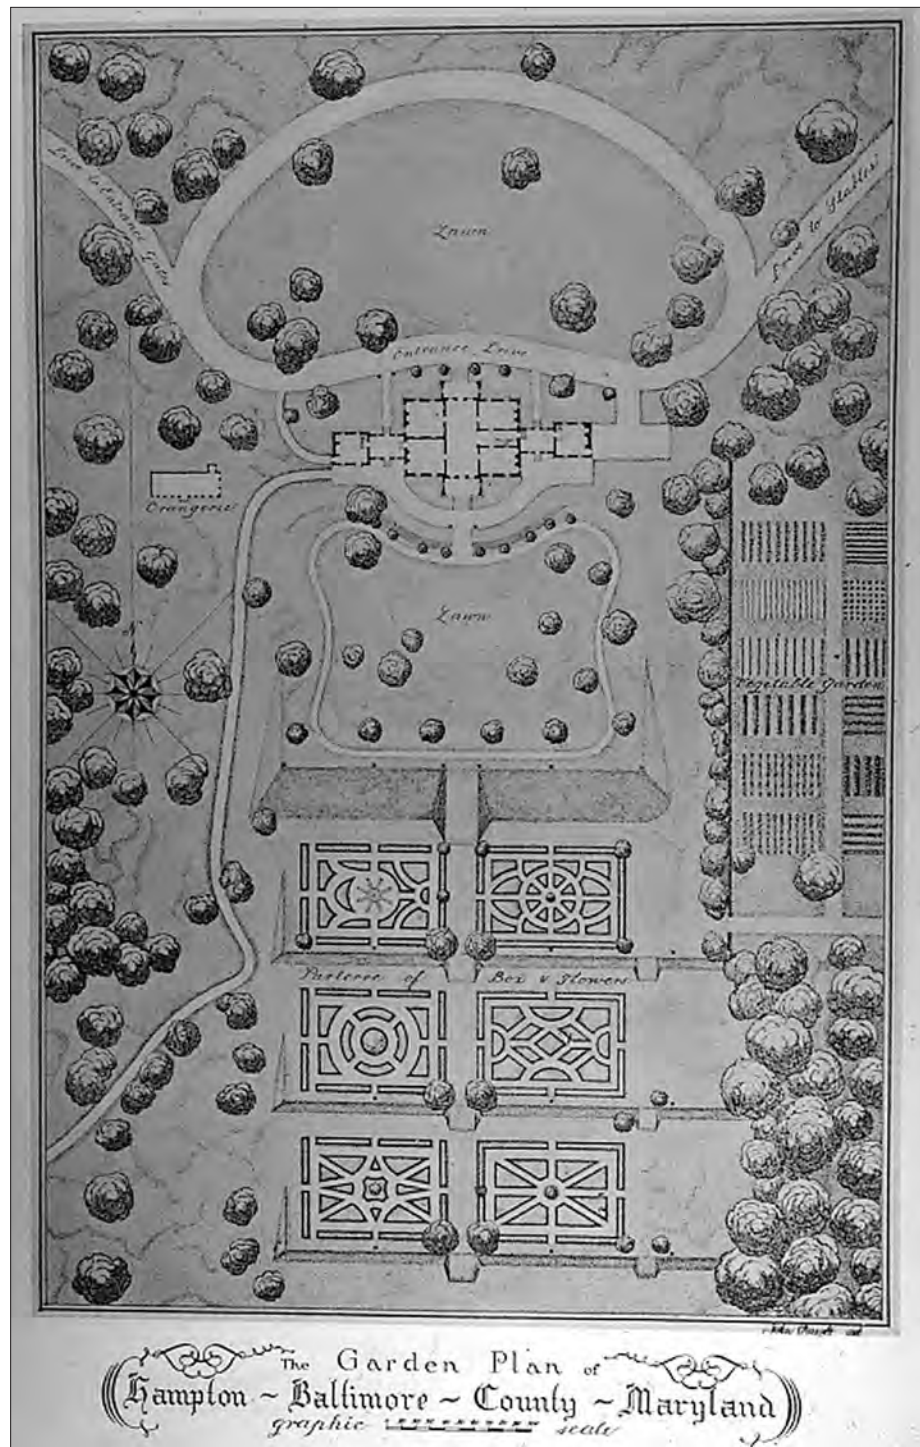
The Garden Plan of Hampton by Lawrence Hall Fowler from *Great Georgian Houses of America* (v. 1, 1933). Plan view, 1903 (HAMP).
